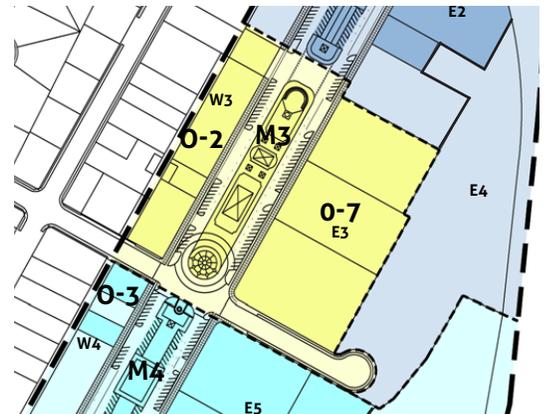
DISTRICT 3 KEY PLAN
